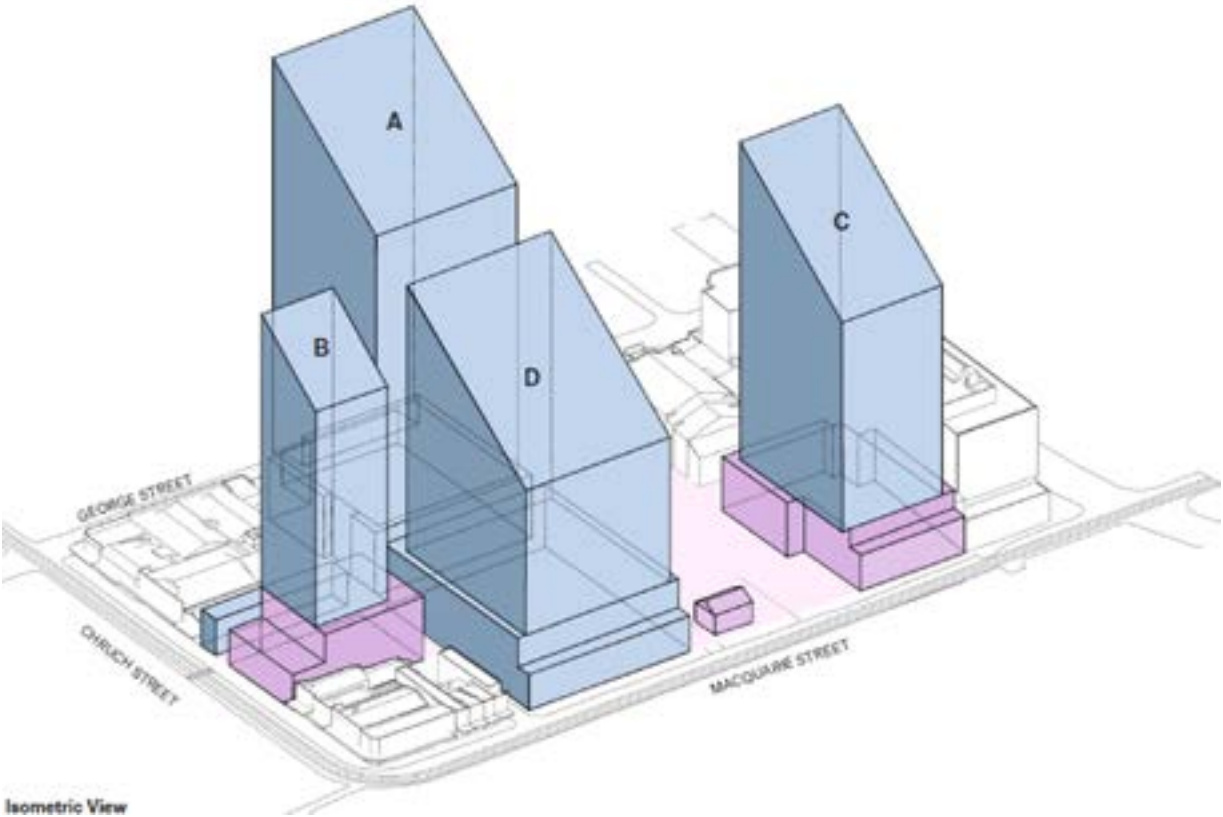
Proposed building envelopes with CSSI works shown in Purple and SSDA works shown in blue
